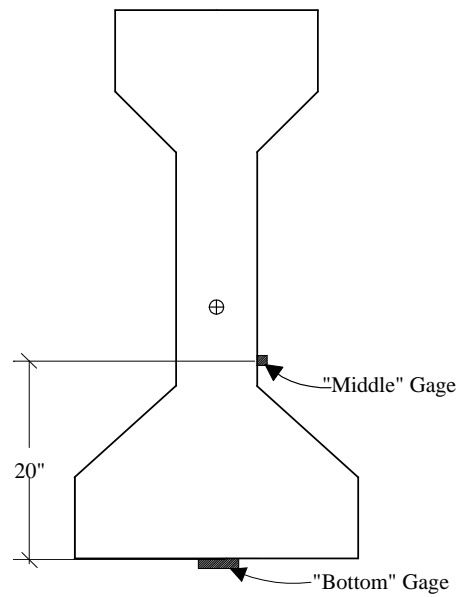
Cross Section of the Type IV Girder with the Two Strain-Gage Locations
